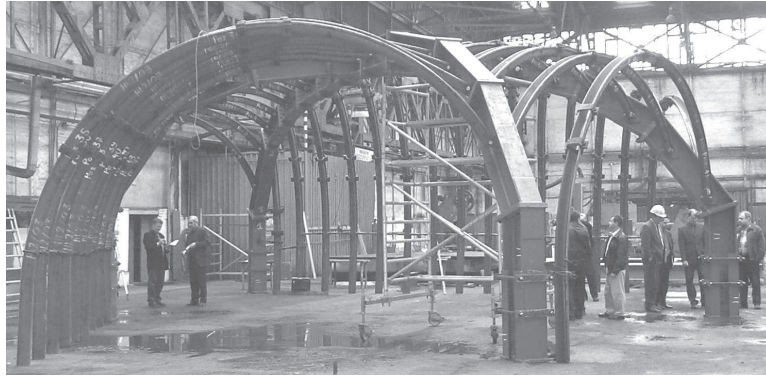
Assembly drawing of the main construction of an exemplary crossing
